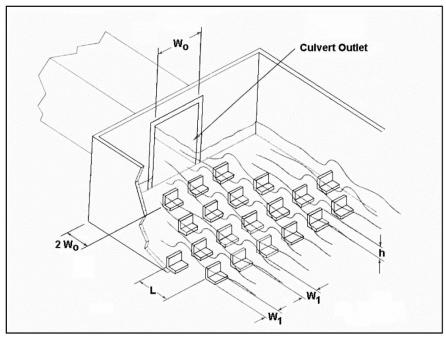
B-2: a perspective view of concrete energy dissipators at the outlet of culverts
